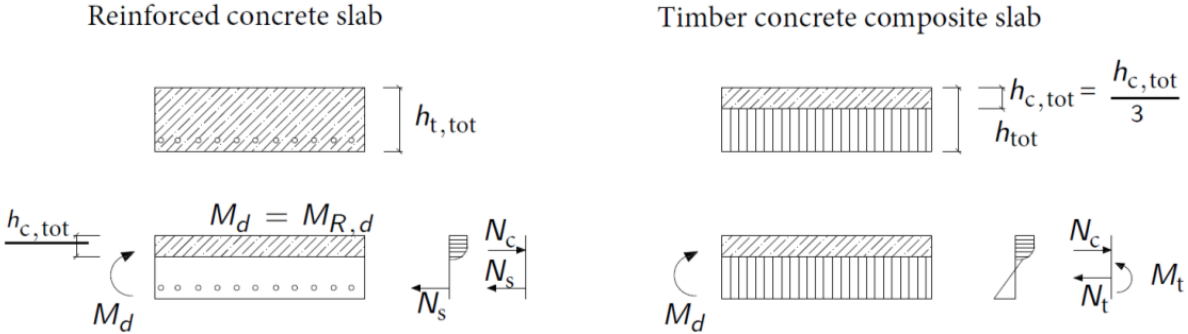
Load transfer (a) for a reinforced concrete slab, (b) for a TCC slab [6, p.18]
